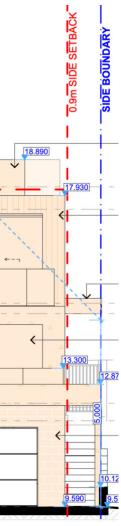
Extract from East Elevation, plan DA12, depicting structures on a nil side setback
